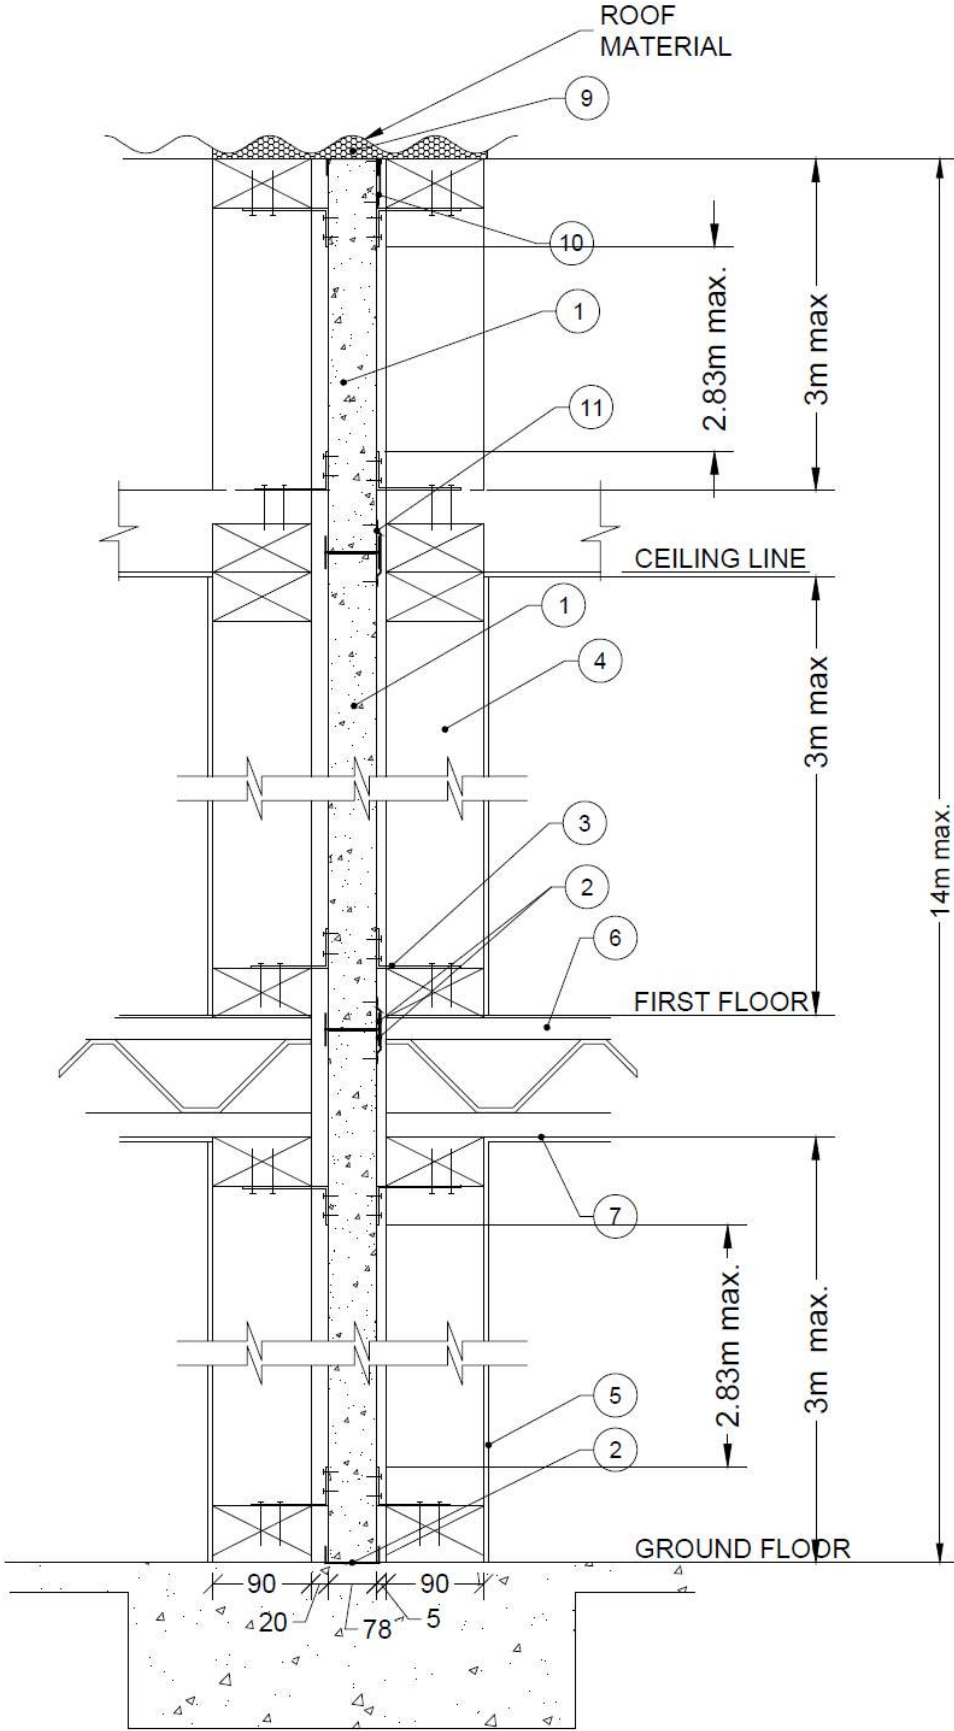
Section Elevation of Speedpanel Partywall System for 120/120/120
